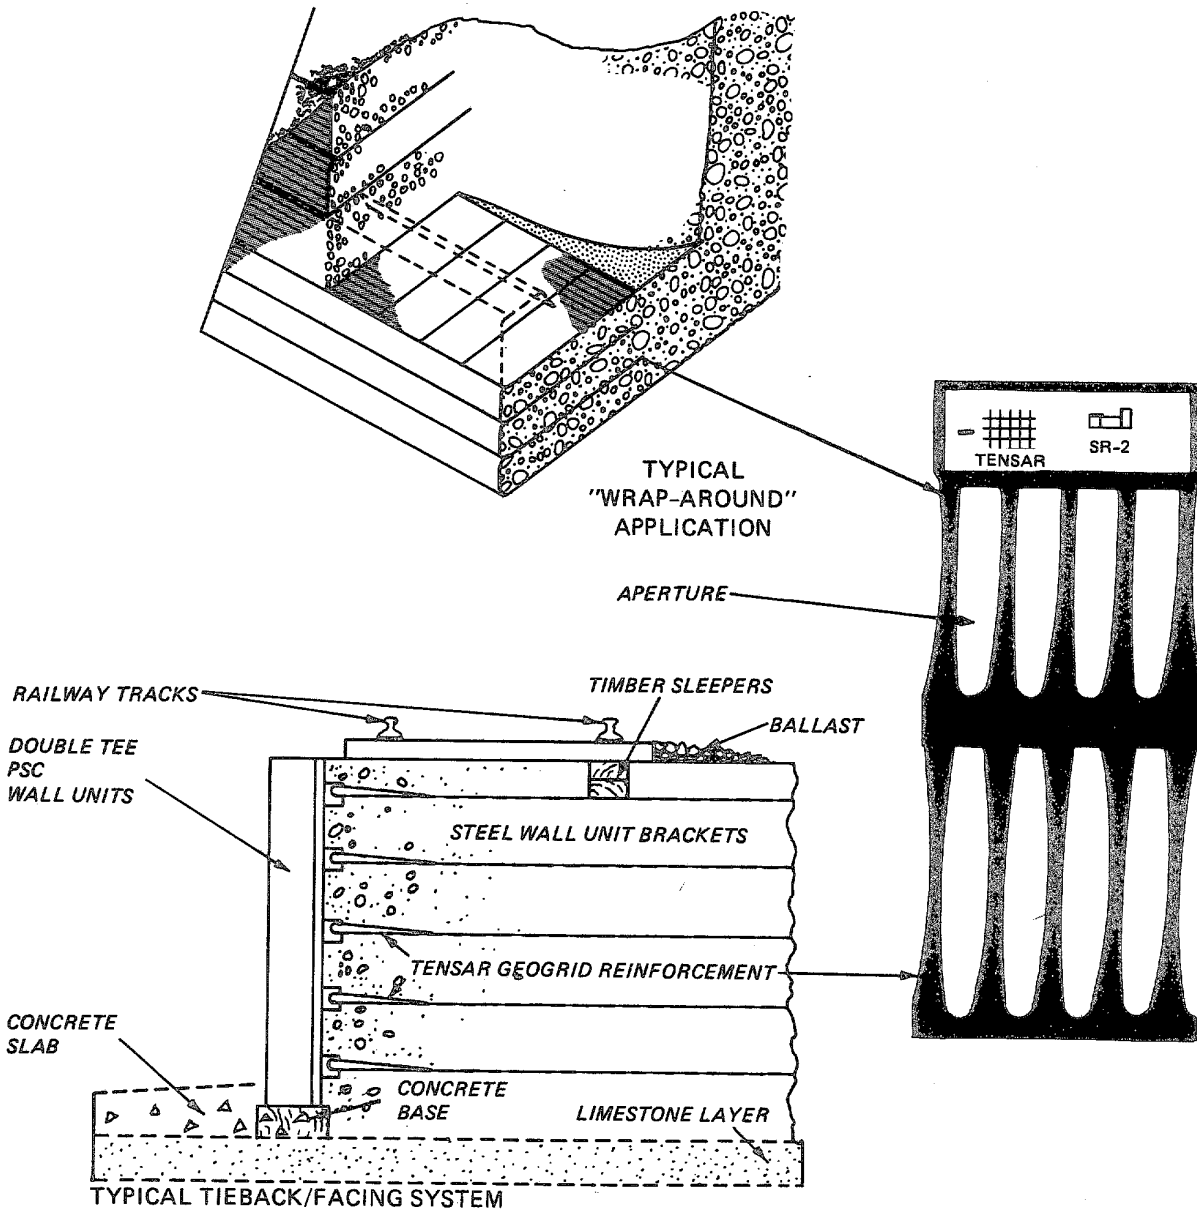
Tensar geogrid retaining wall (adapted from Tensar Corporation 1984)
